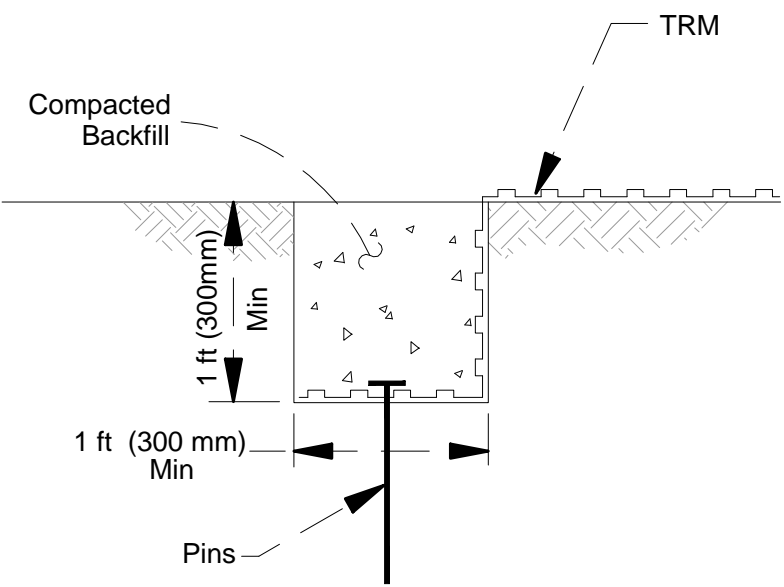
LONGITUDINAL EDGE TRENCH DETAIL
